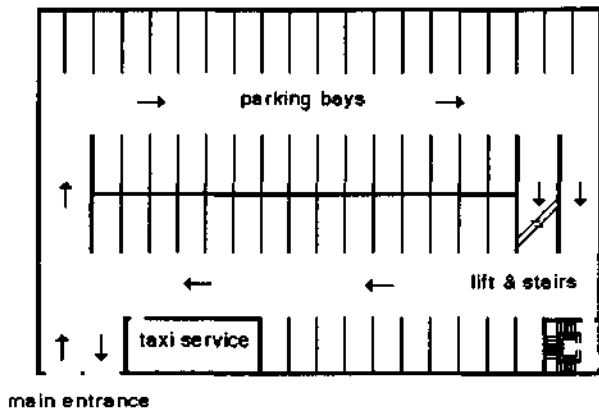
Diagrammatic plan of the entrance floor of the parking garage in the Dover town center.
